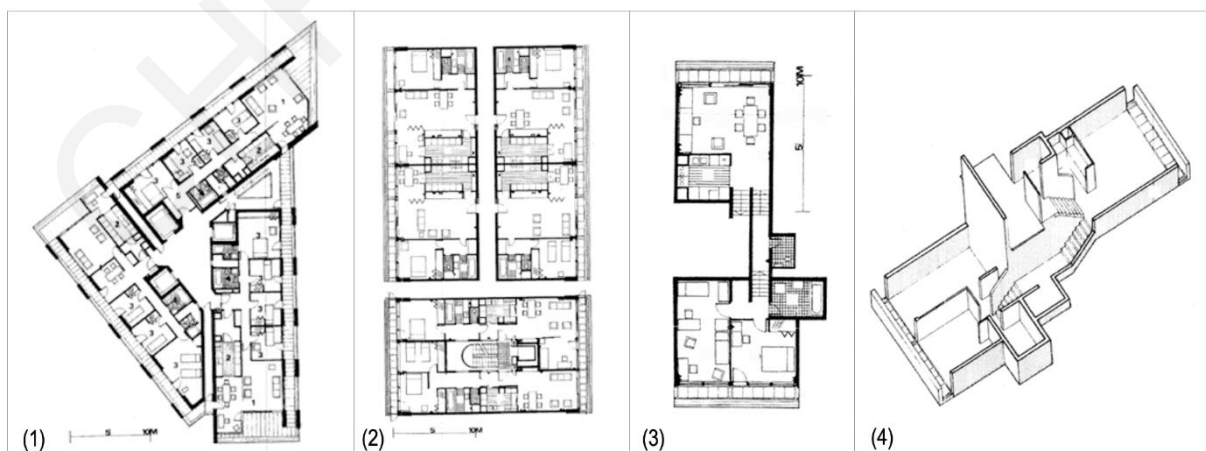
Typical Tower Plan (1), Typical Slab Plans (2), Typical Flat Plan (3) and Axonometric diagram of a Split-Level Apartment (4) [22].
